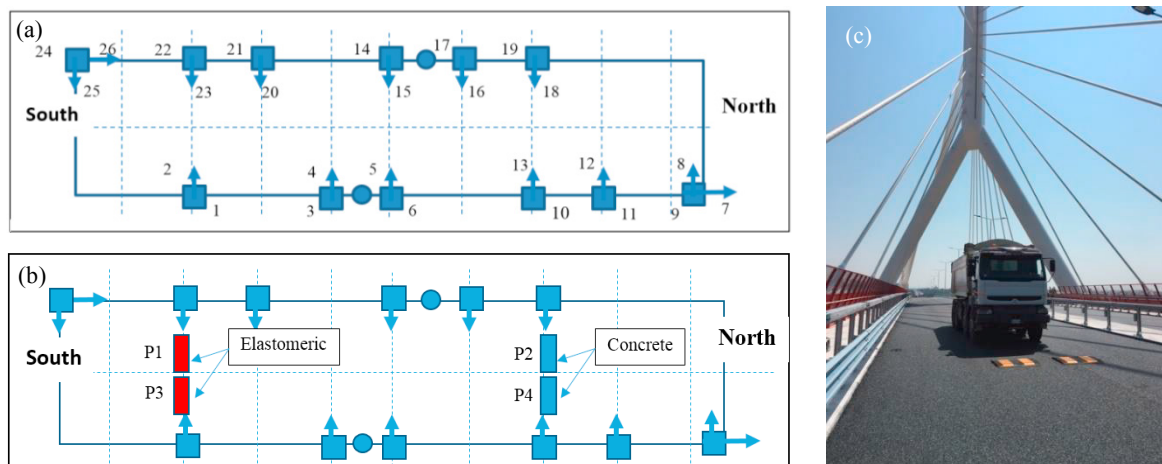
(a) Accelerometers, and (b) bumpers location on the bridge. (c) 38t truck in the elastomeric bumpers of position P1.
